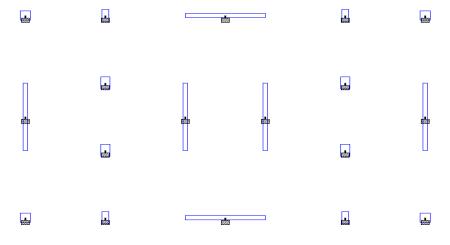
Plan view of RC frame model with Shear Wall in STAAD
